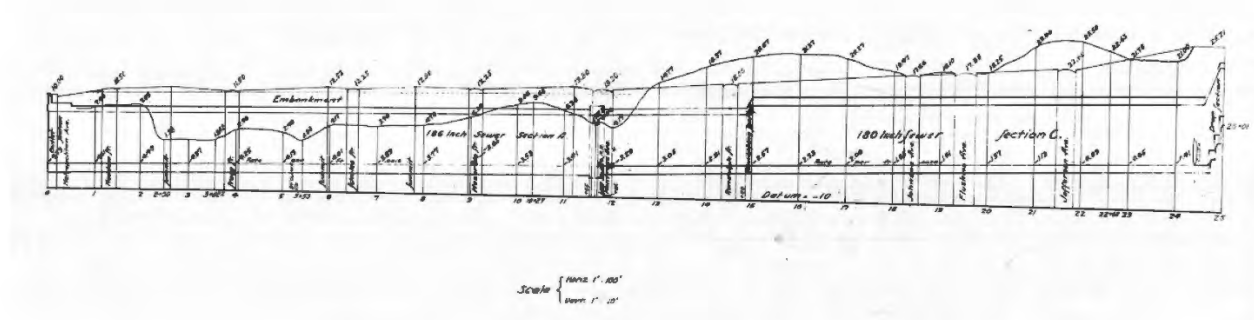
Longitudinal Profile of NC-083 Outfall Barrel.
